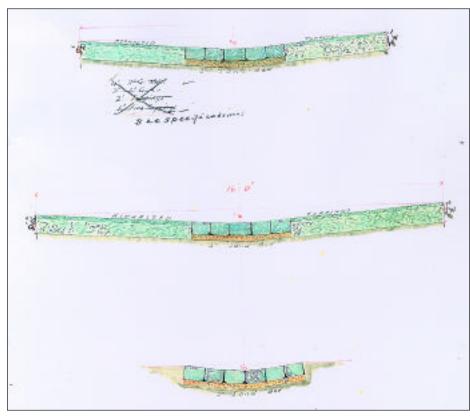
Engeneering Drawing, construction of Right of Way, Thurston Street to Hopetoun Parade, Box Hill, 1910, Shire of Nunawading, "City of Whitehorse".
